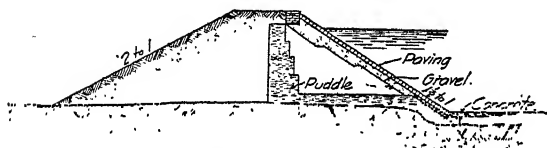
Section of Reservoir Embankment, Brooklyn.
